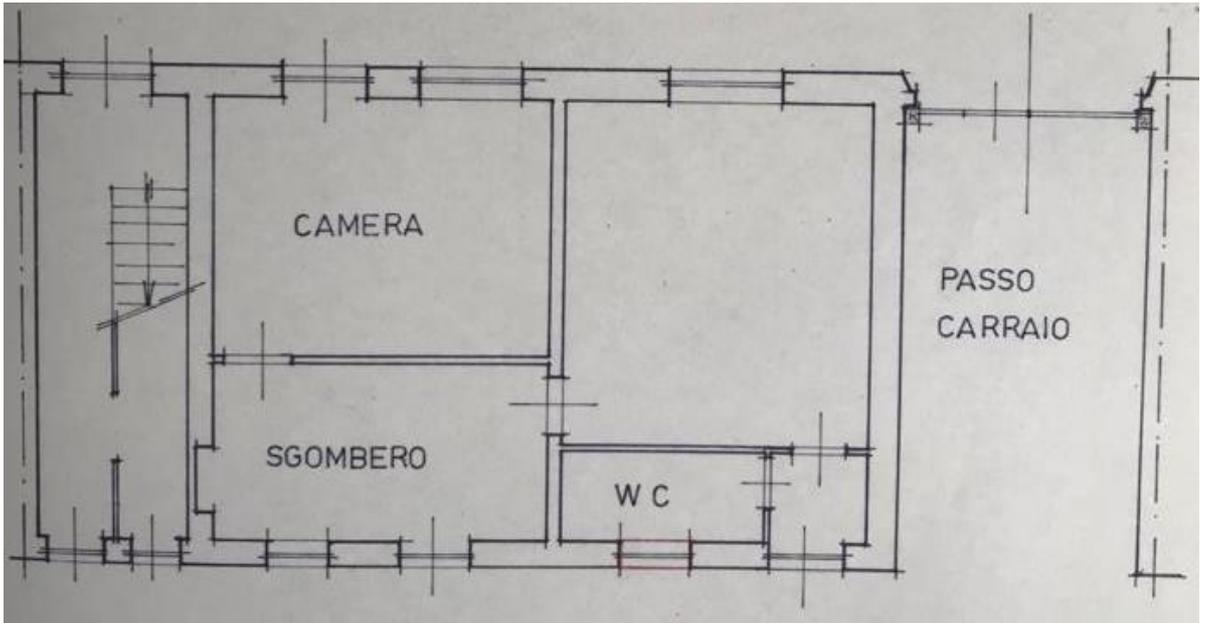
Ground Floor Plan (Via Alfieri 4)
